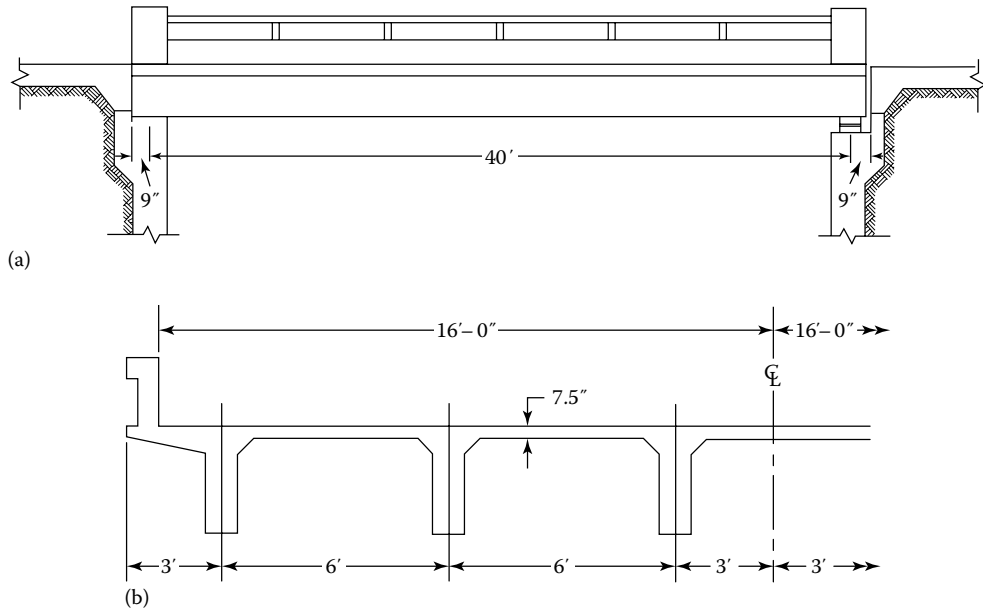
Superstructure Type *d*: a cast-in-place T-beam bridge. (a) Elevation and (b) cross section. (Note: dimensions shown are for illustrative purposes only; cross-sectional dimensions may vary depending on the number of design lanes.)
